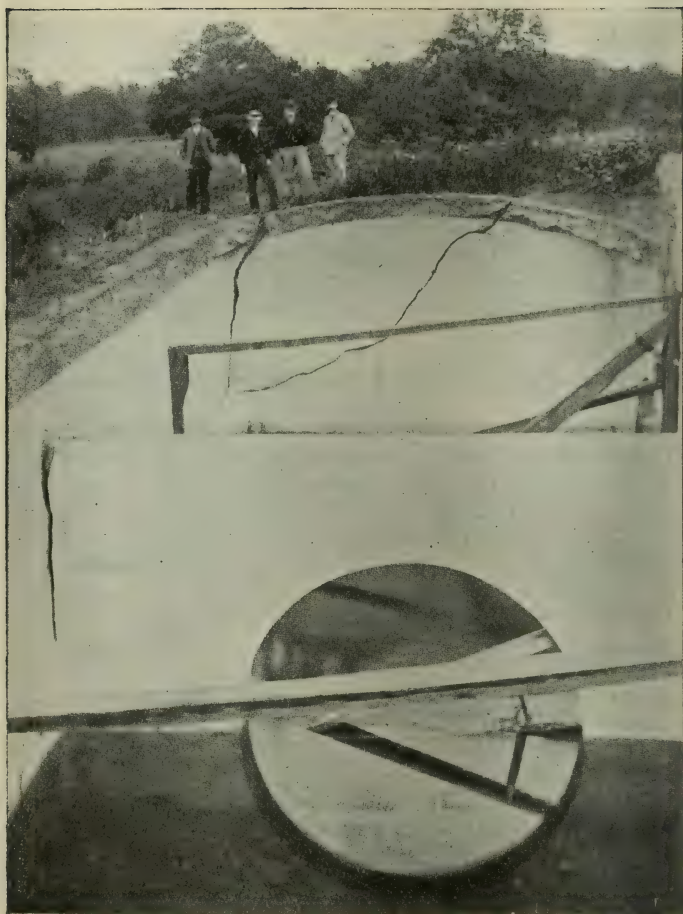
Concrete Reservoir Failure : West Bay, looking North.
